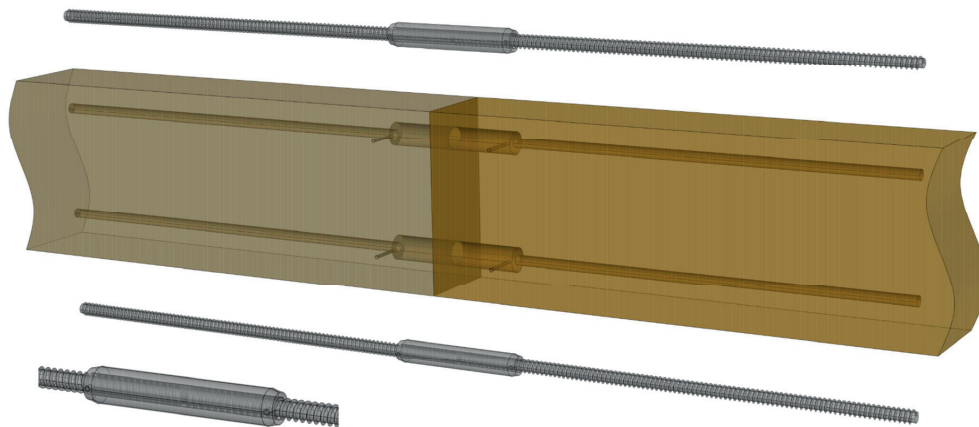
Layout of splice connection with long threaded rods and grout-filled couplers.
